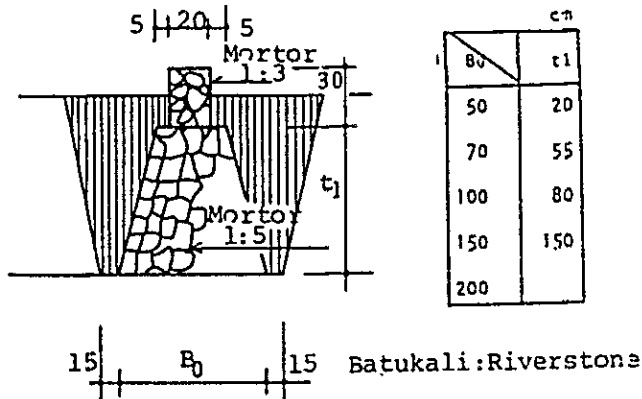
BATUKALI-CONTINUOUS FOUNDATION DETAIL
